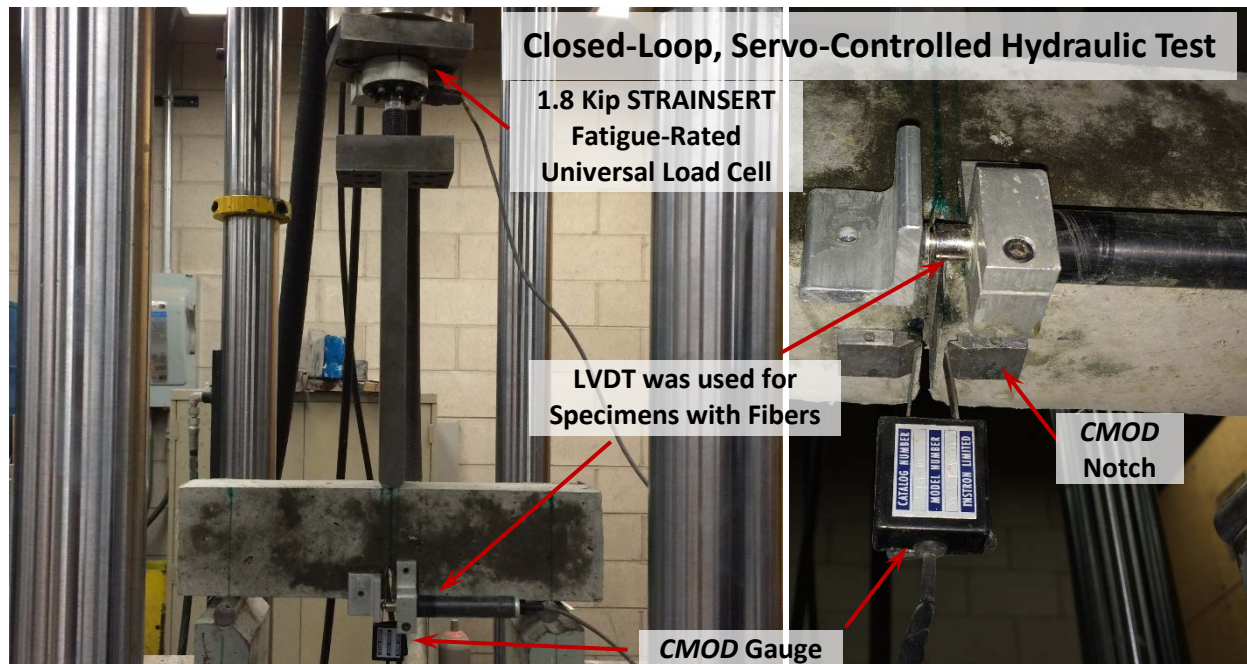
Testing setup and configuration for the fracture-mechanics test.
